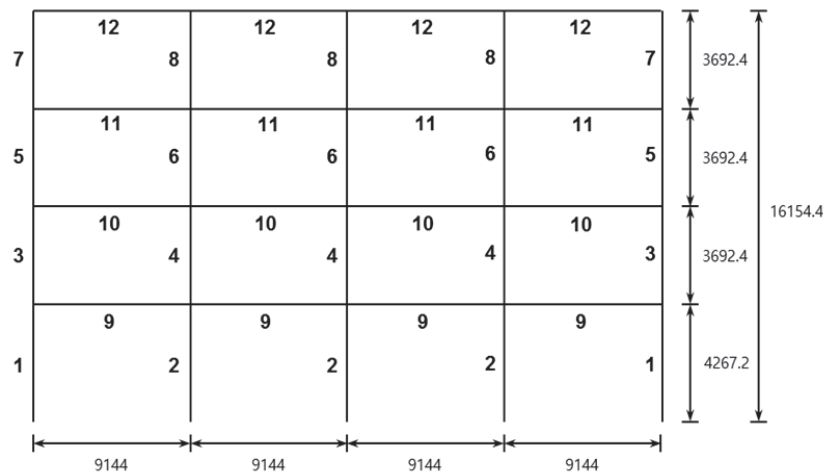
Example 4 story and 4 span reinforced concrete frame (Unit: mm)
